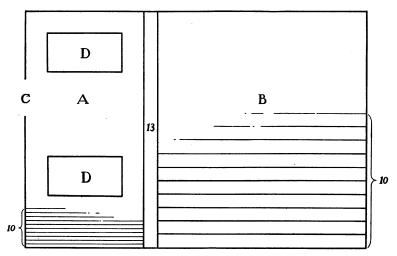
Diagrammatic View of House Floor. A, Living section (witinum); B, Storage section (but); C, Doorway; D, Fireplace; 10 in B, Flooring, usually of limbum palm; 10 in A, Flooring, usually of bamboo.
